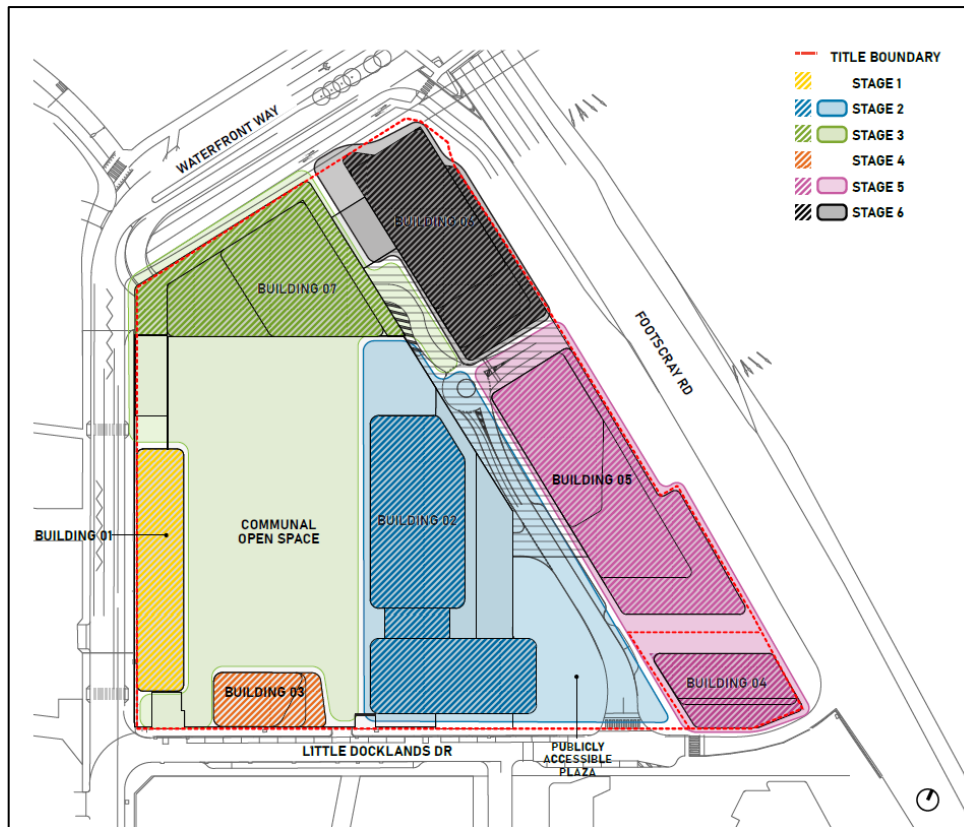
Staging Plan (source: The Waterfront City East Development Plan)
